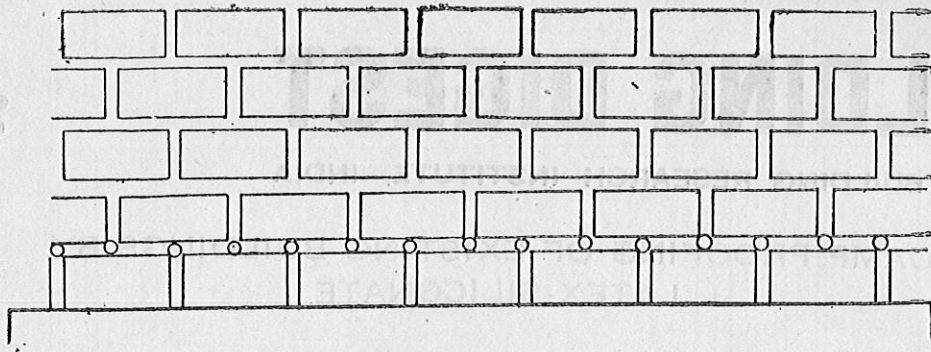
Wall showing holes drilled at 10 cm distance in a mortar joint above the floor level
